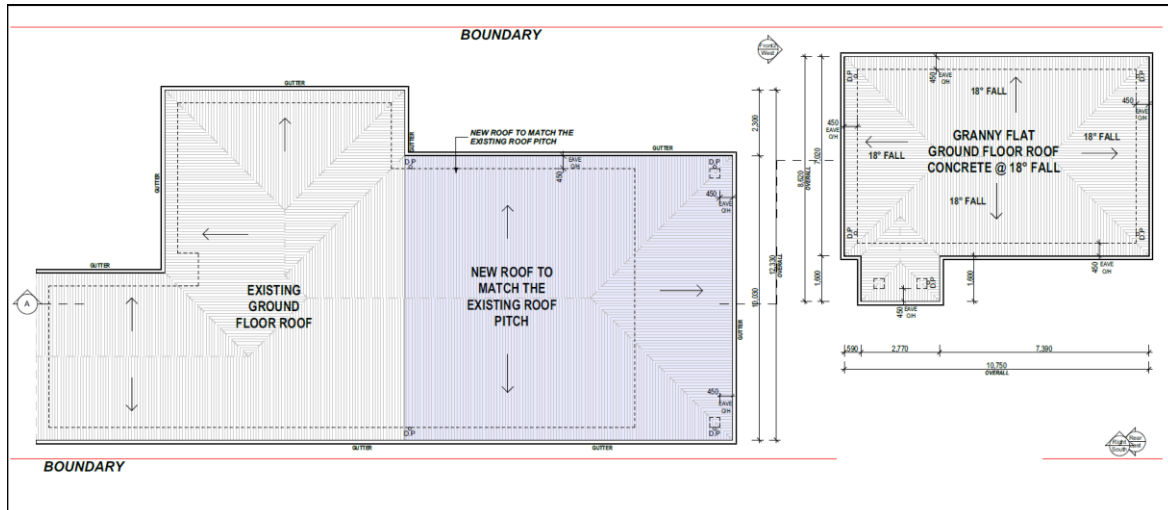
Proposed ground roof plan(s) - principal dwelling (left); secondary dwelling (right)
